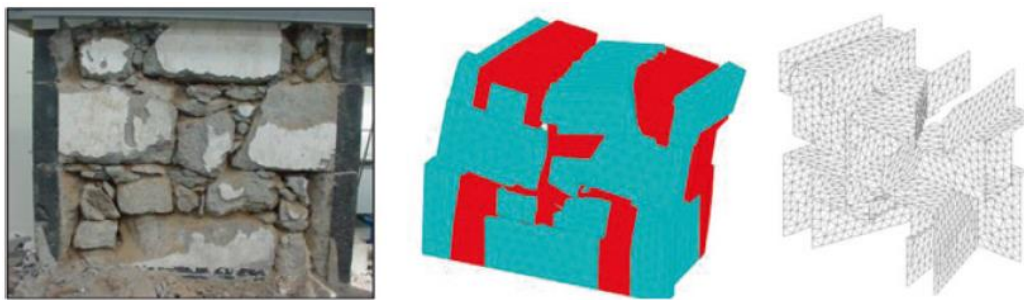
Micro-modelling of a masonry wall from Azores. (Costa et al., 2014).
